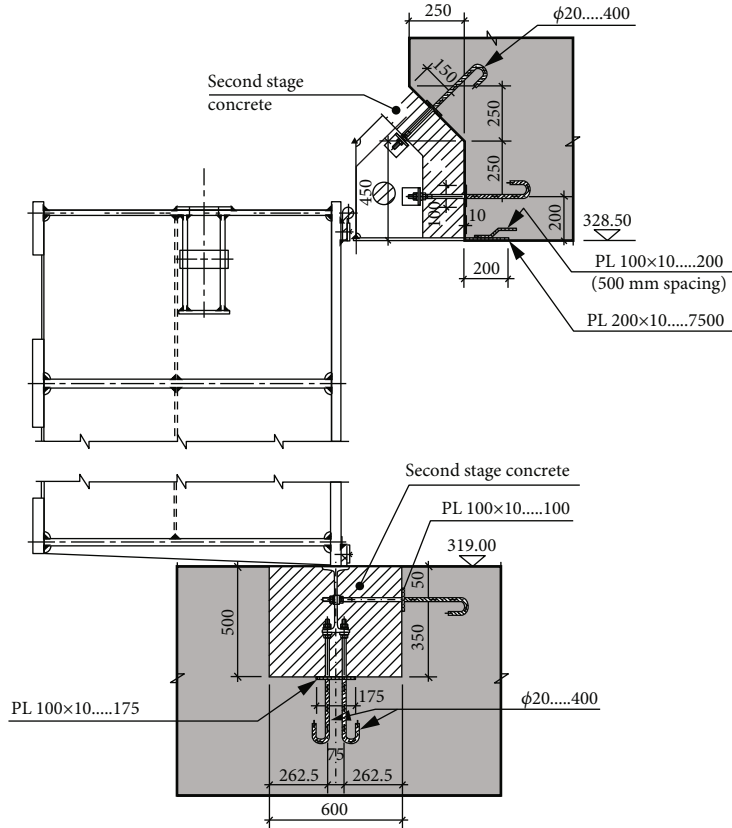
Detail 1: steel plates and anchor connections in the first and second phases of the concrete.
